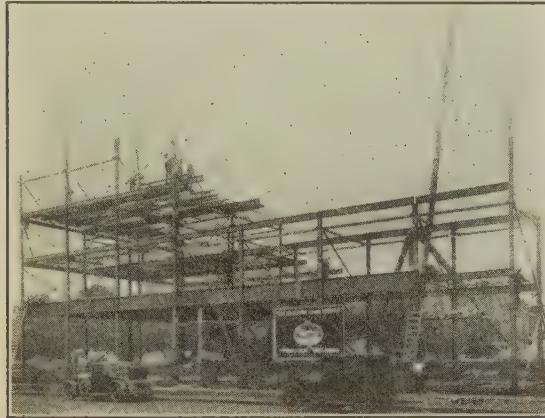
SHOWS FRAMING PARTLY ERECTED WITH 36-IN. GIRDER WELDED IN POSITION
